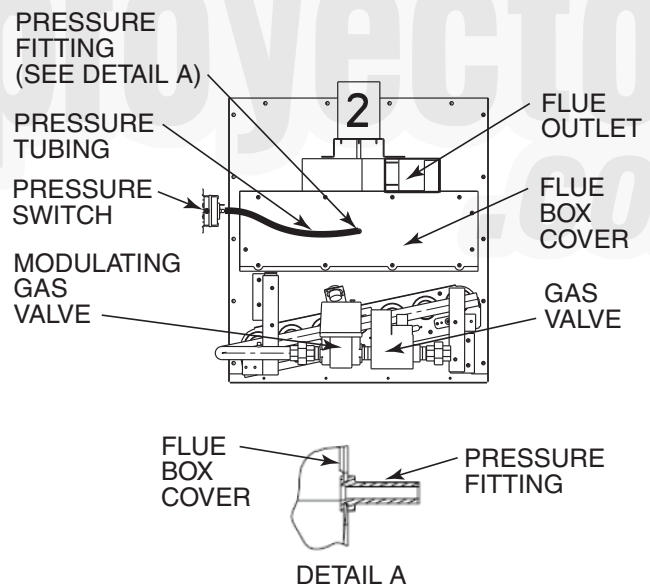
Gas Section Detail, Modulating Gas Heat
